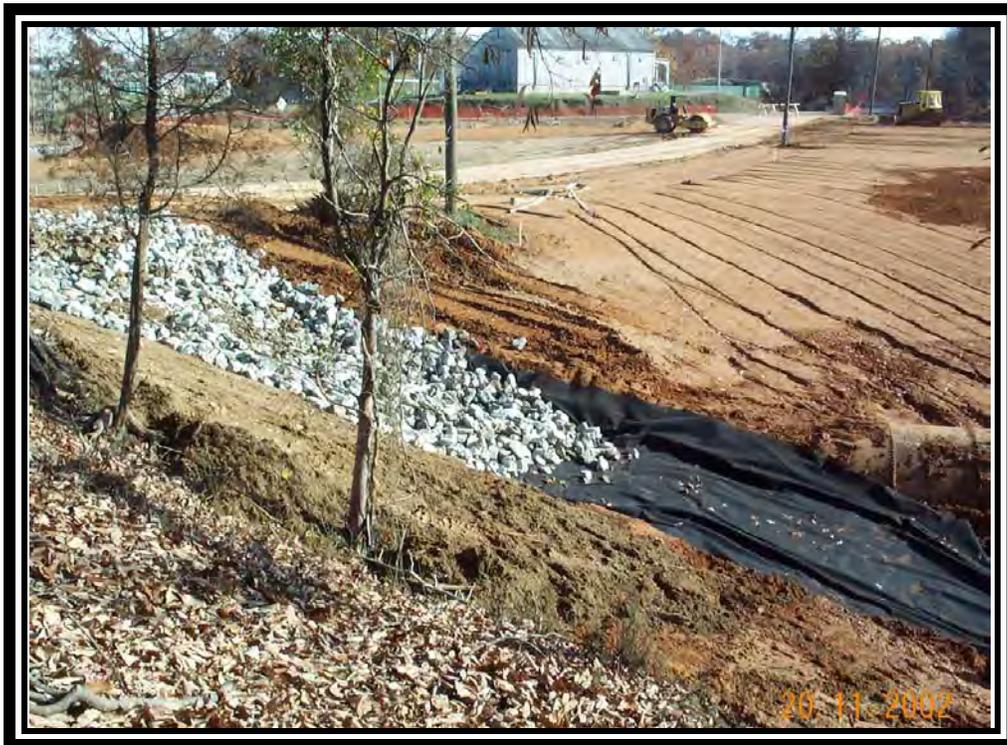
Riprap Lined Channel in Area 1 to Minimize Soil Erosion
